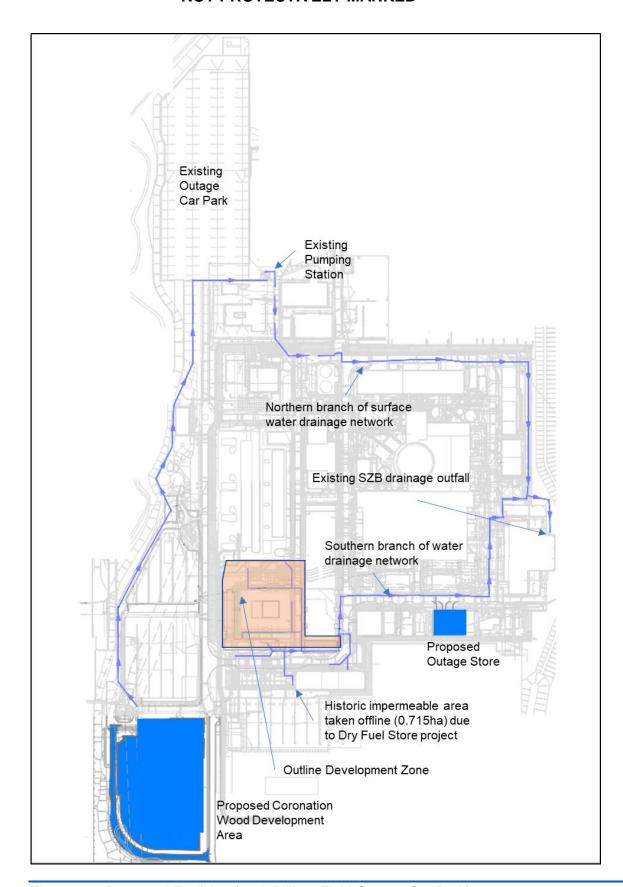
Proposed Facilities (excl. Pillbox Field Outage Car Park)
